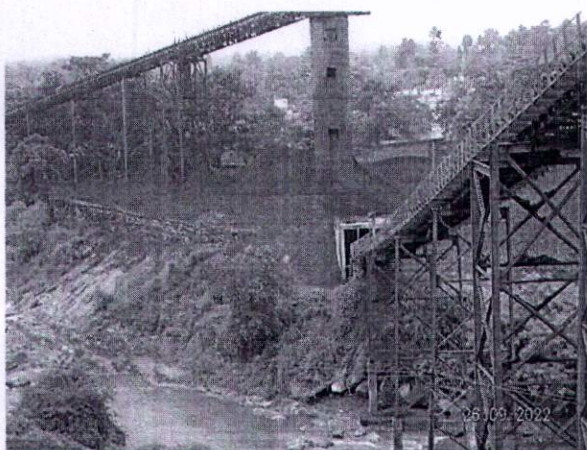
Photo of wall broken and coal beyond project boundary adjacent to Sonadubi river
